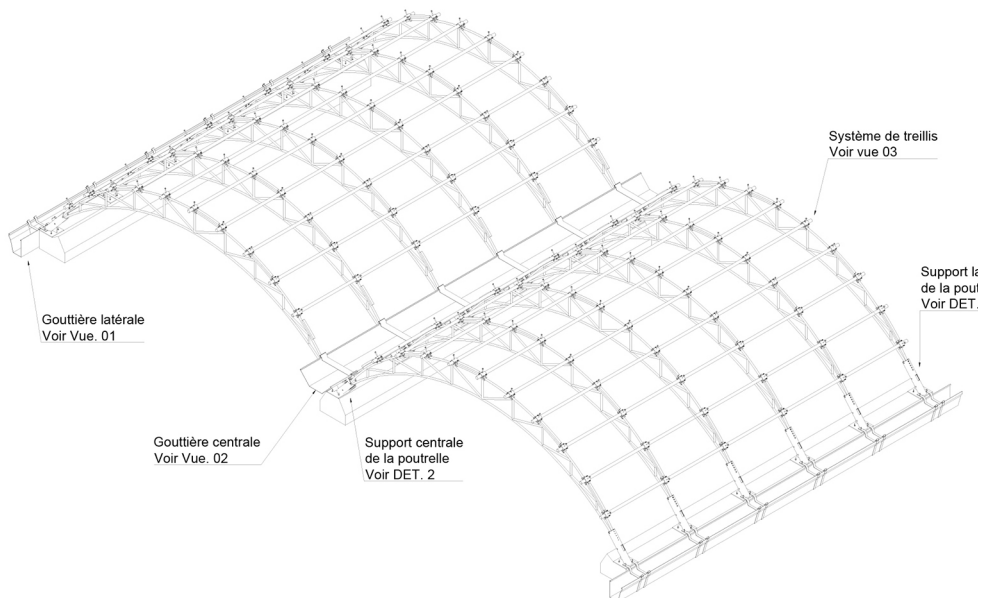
Ventilated roof structure* (Arzjani & Baghirova, 2023).
